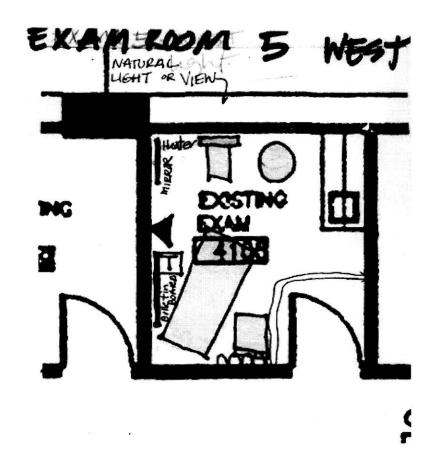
Drawing of exam room #5 west. Focus of drawing is furniture layout and location of space on perimeter wall.
